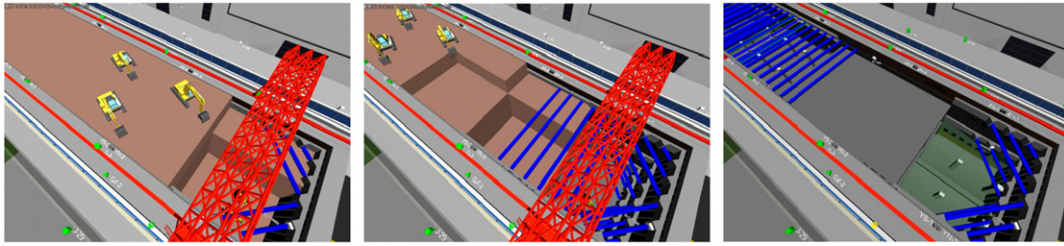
4D visualization of construction process of a metro station construction using open cut method.
